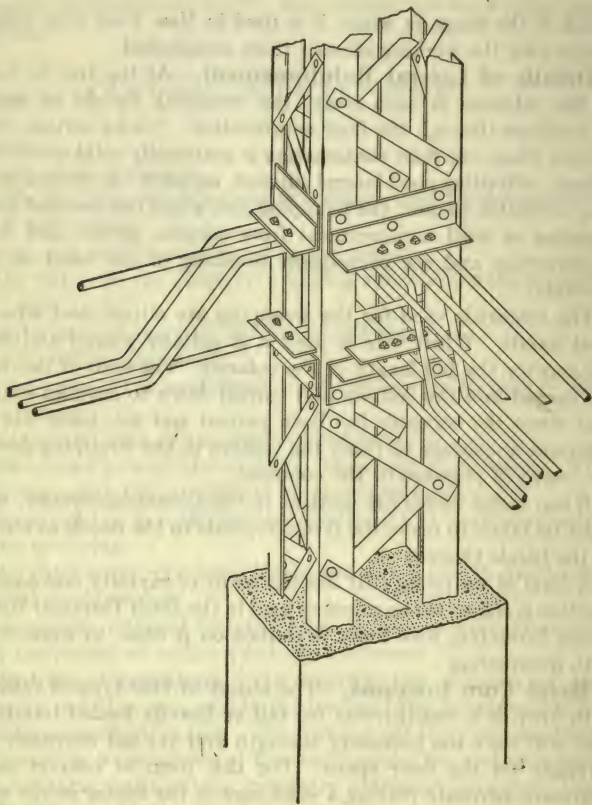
Column, and Girder and Column Connection, McGraw Building, N. Y.
